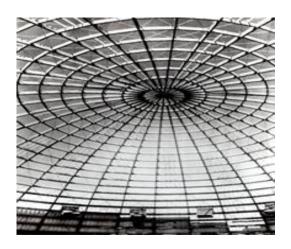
Montan State College Dome (Source: www.glulam.co.uk)
